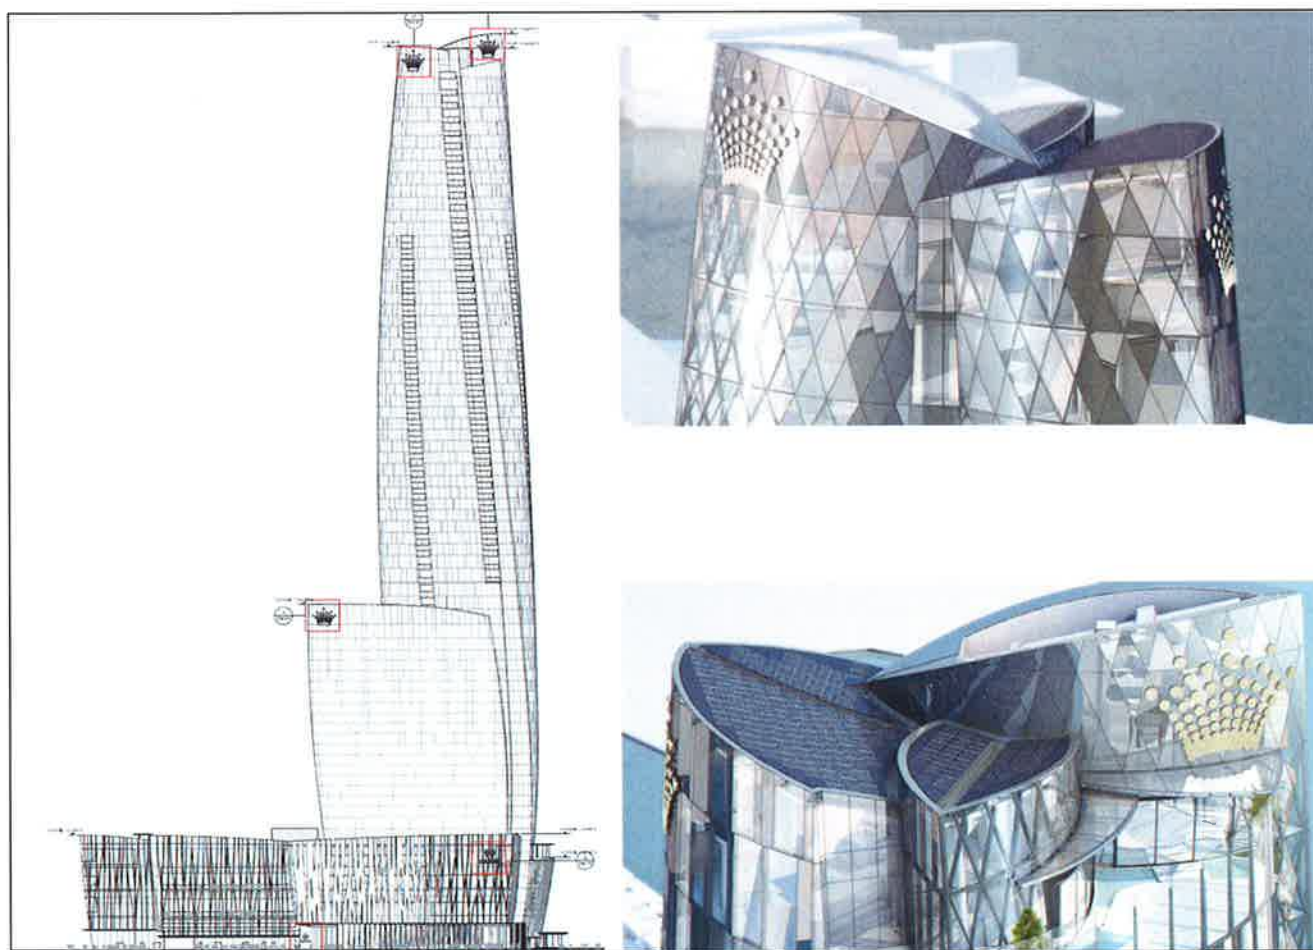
Proposed signage on the eastern elevation (left) and visualisation of tower signage (right)
